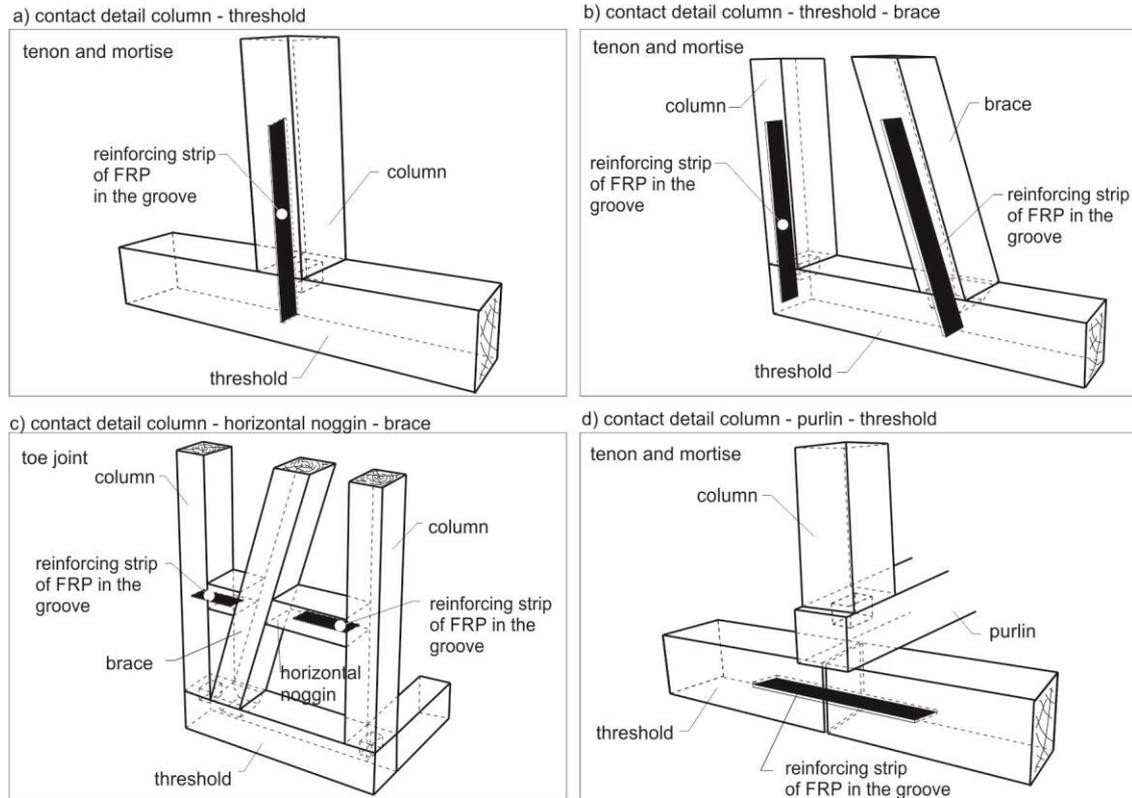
Application of FRP fabrics in grooves for strengthening carpentry joints of half-timbered constructions
